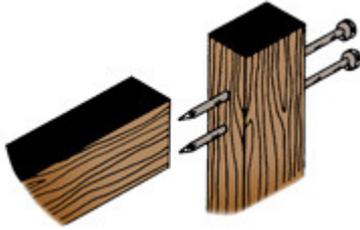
A simple butt joint is formed by nailing or screwing two ends together.
